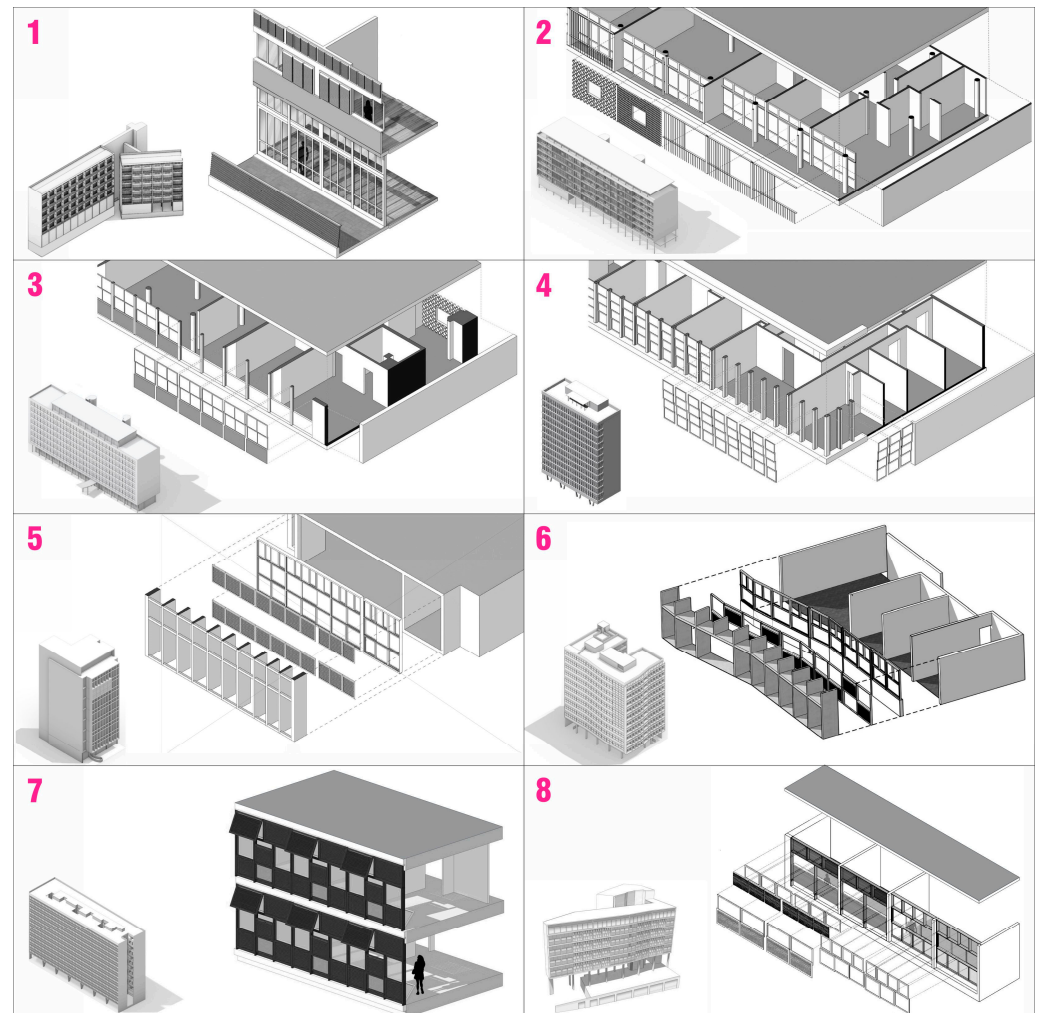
Carioca Modern Façades selected buildings, volume and façade system. 1- Barreto building, by Irmãos Roberto, 1947; 2- Bristol building, by Lucio Costa, 1950; 3- Nova Cintra building, by Lucio Costa, 1948; 4- Barão Gravata building, by Sérgio Bernardes, 1952; 5- MMM Roberto, by Irmãos Roberto, 1945; 6- D. Fátima building, by Irmãos Roberto, 1951; 7- Angel Ramirez building, by Irmãos Roberto, 1954; 8- Sambaíba building, by Irmãos Roberto, 1953. Image adapted from Mara Eskinazi [32].
